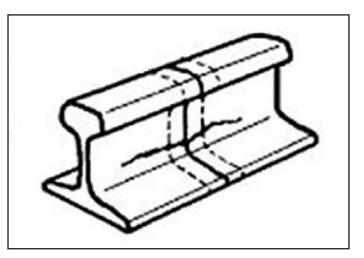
Schematically presented rail web crack in the welded joint area [13, 14]
